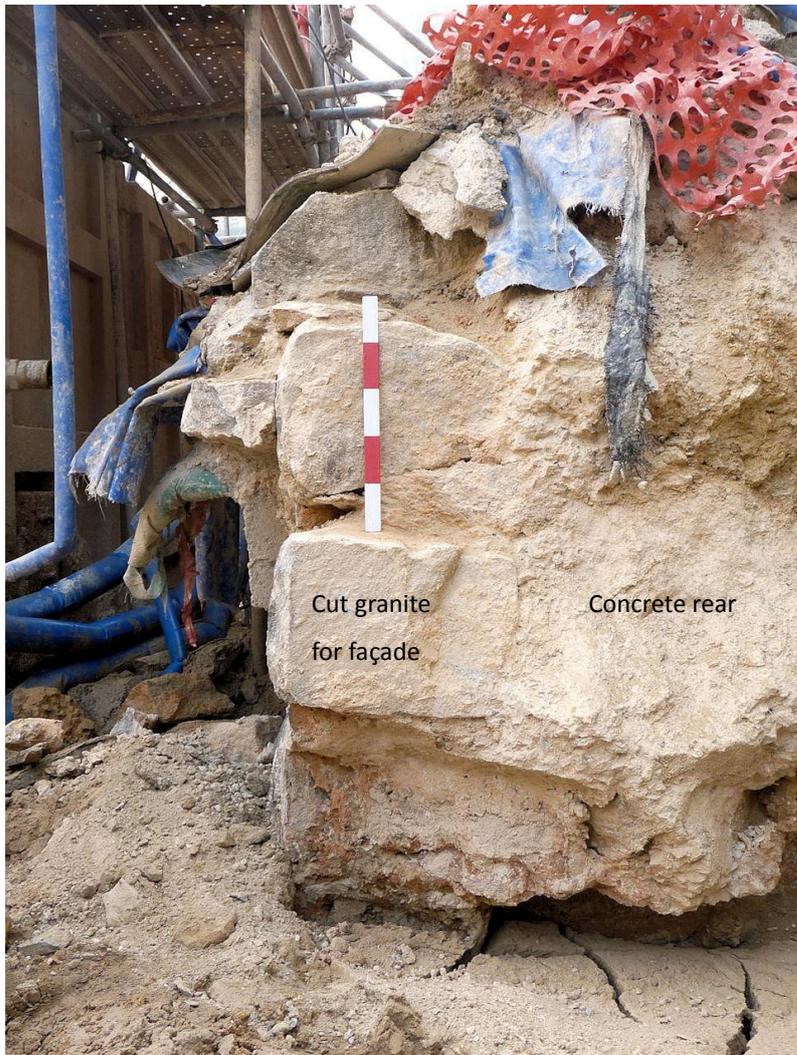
B.2 Photograph showing the section of the southern retaining wall, which shows the concrete backing and cut granite front wall.
